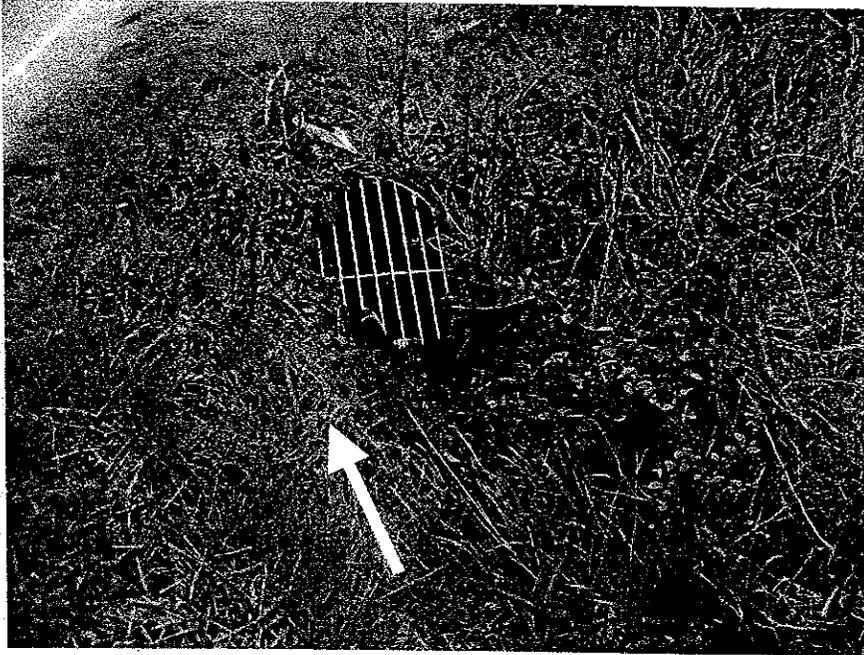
Shows the inlet to an existing 48" pipe with trash rack. The pipe extends to the south to a series of catch basins along Sultan Basin Road. Looking South.
